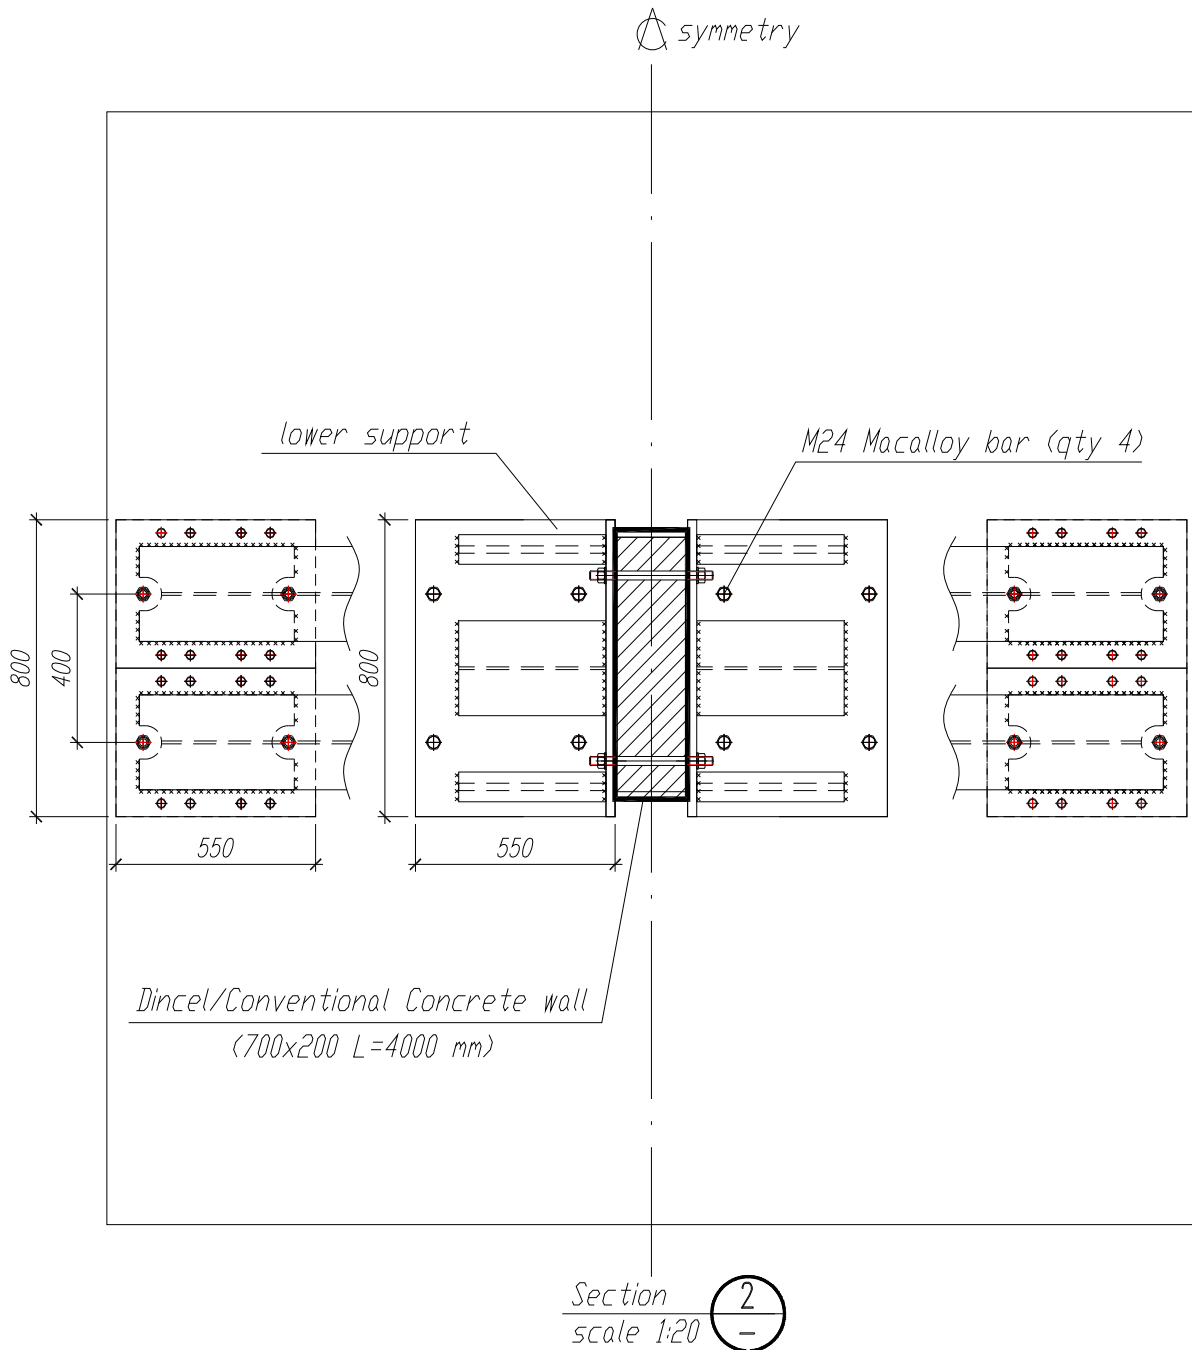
Dintel Wall Shake Table Testing Set up, section 2
